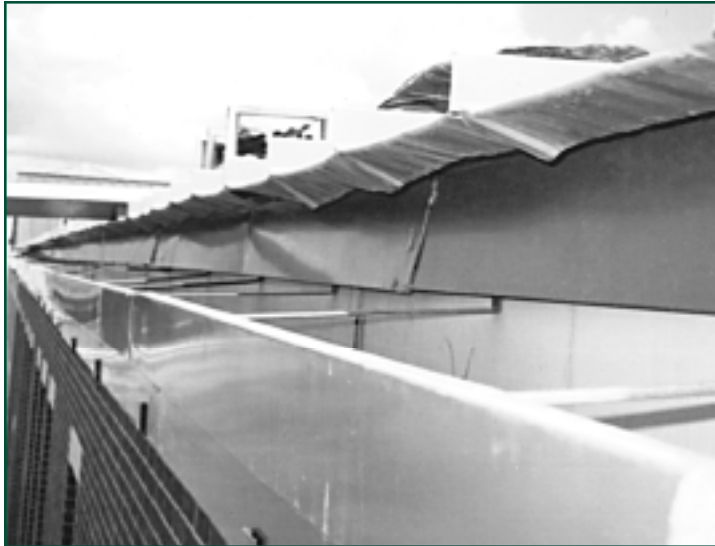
View along eave/gutter line of metal roof. The edge is open to water intrusion under the panels and into the building. Building design is zero overhang at eave/gutter and brick wall.
